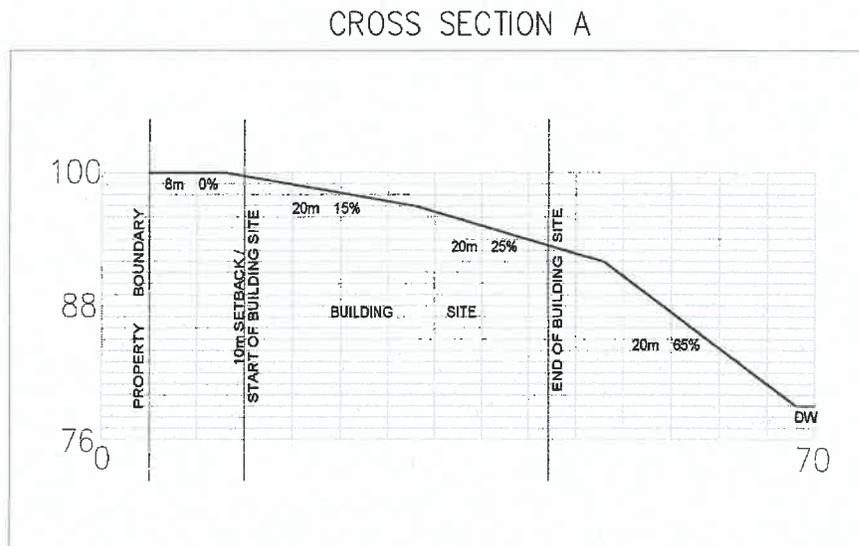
Cross section from the WAPS drawings (Reference No. 4)
